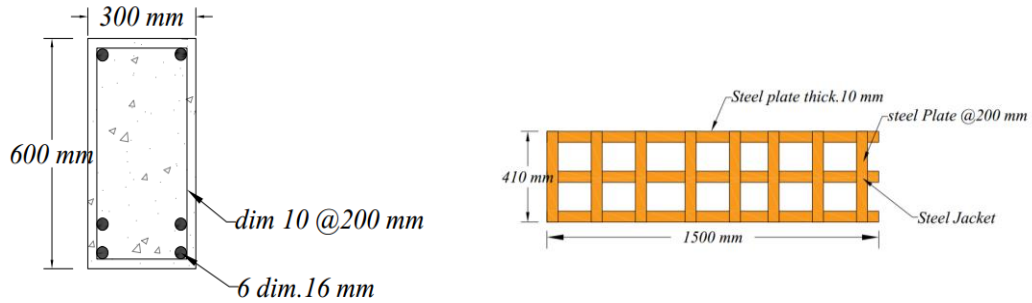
Details of Steel Reinforcement and Steel Jacket.
